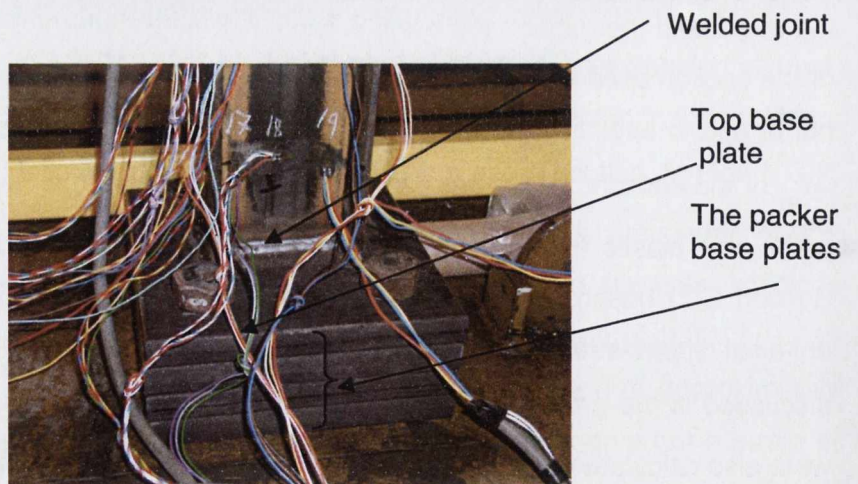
(b) Beam welded to the base and connected to the internal reaction frame by nut and bolt arrangement.
